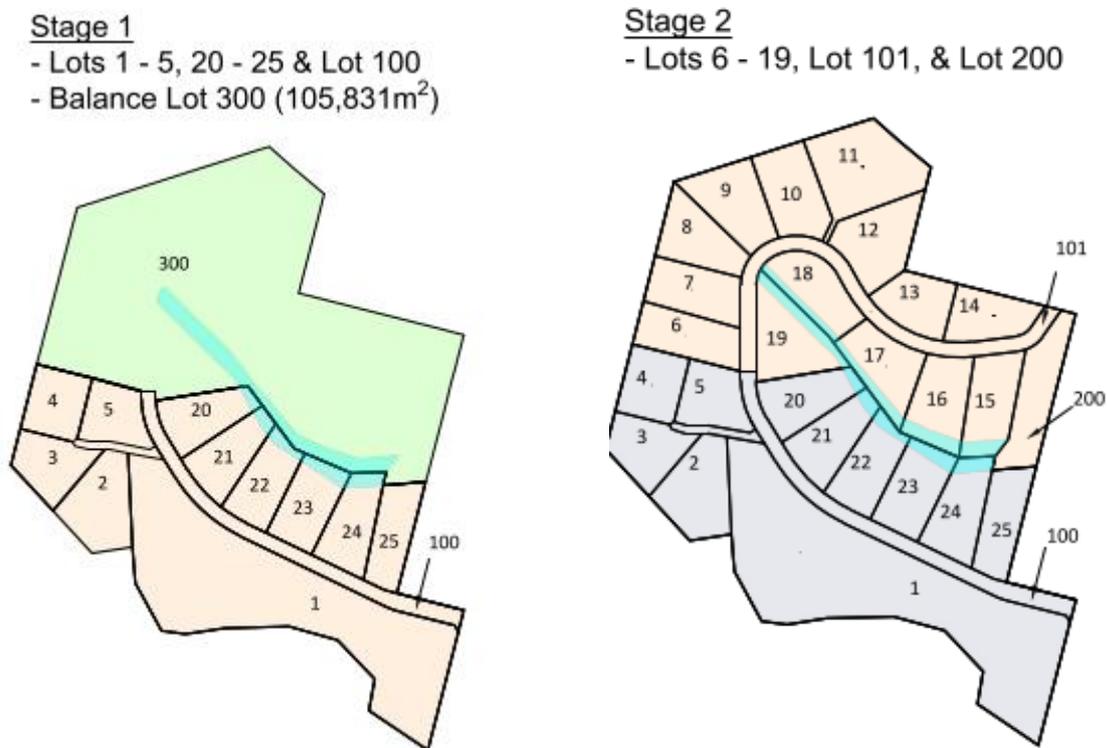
Allotment configuration for Stages 1 and 2. Source: Revised Scheme Plan¹.
